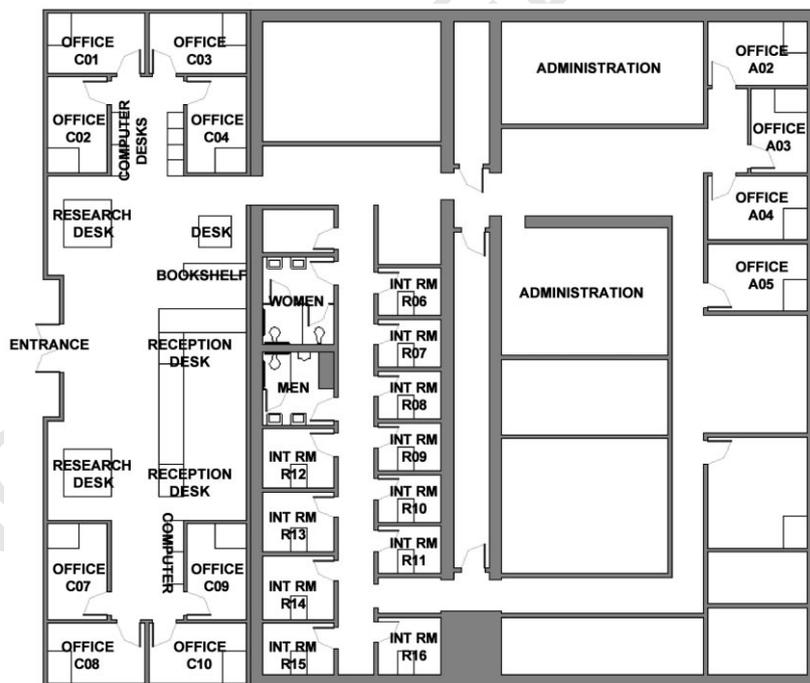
Floor plan of an actual facility. As shown in Fig. 22, the motion planner found that it lacked wheelchair accessibility to the men's toilet. As shown in Fig. 23, the men's toilet is indeed inaccessible to a wheelchair user.
